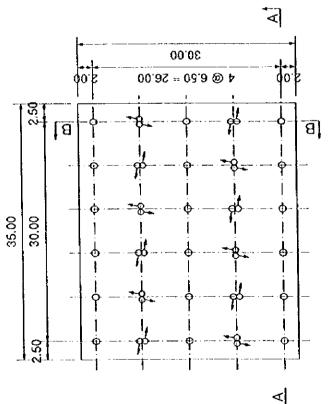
(2) Typical Cross Section of Detached Pier of Surabaya
